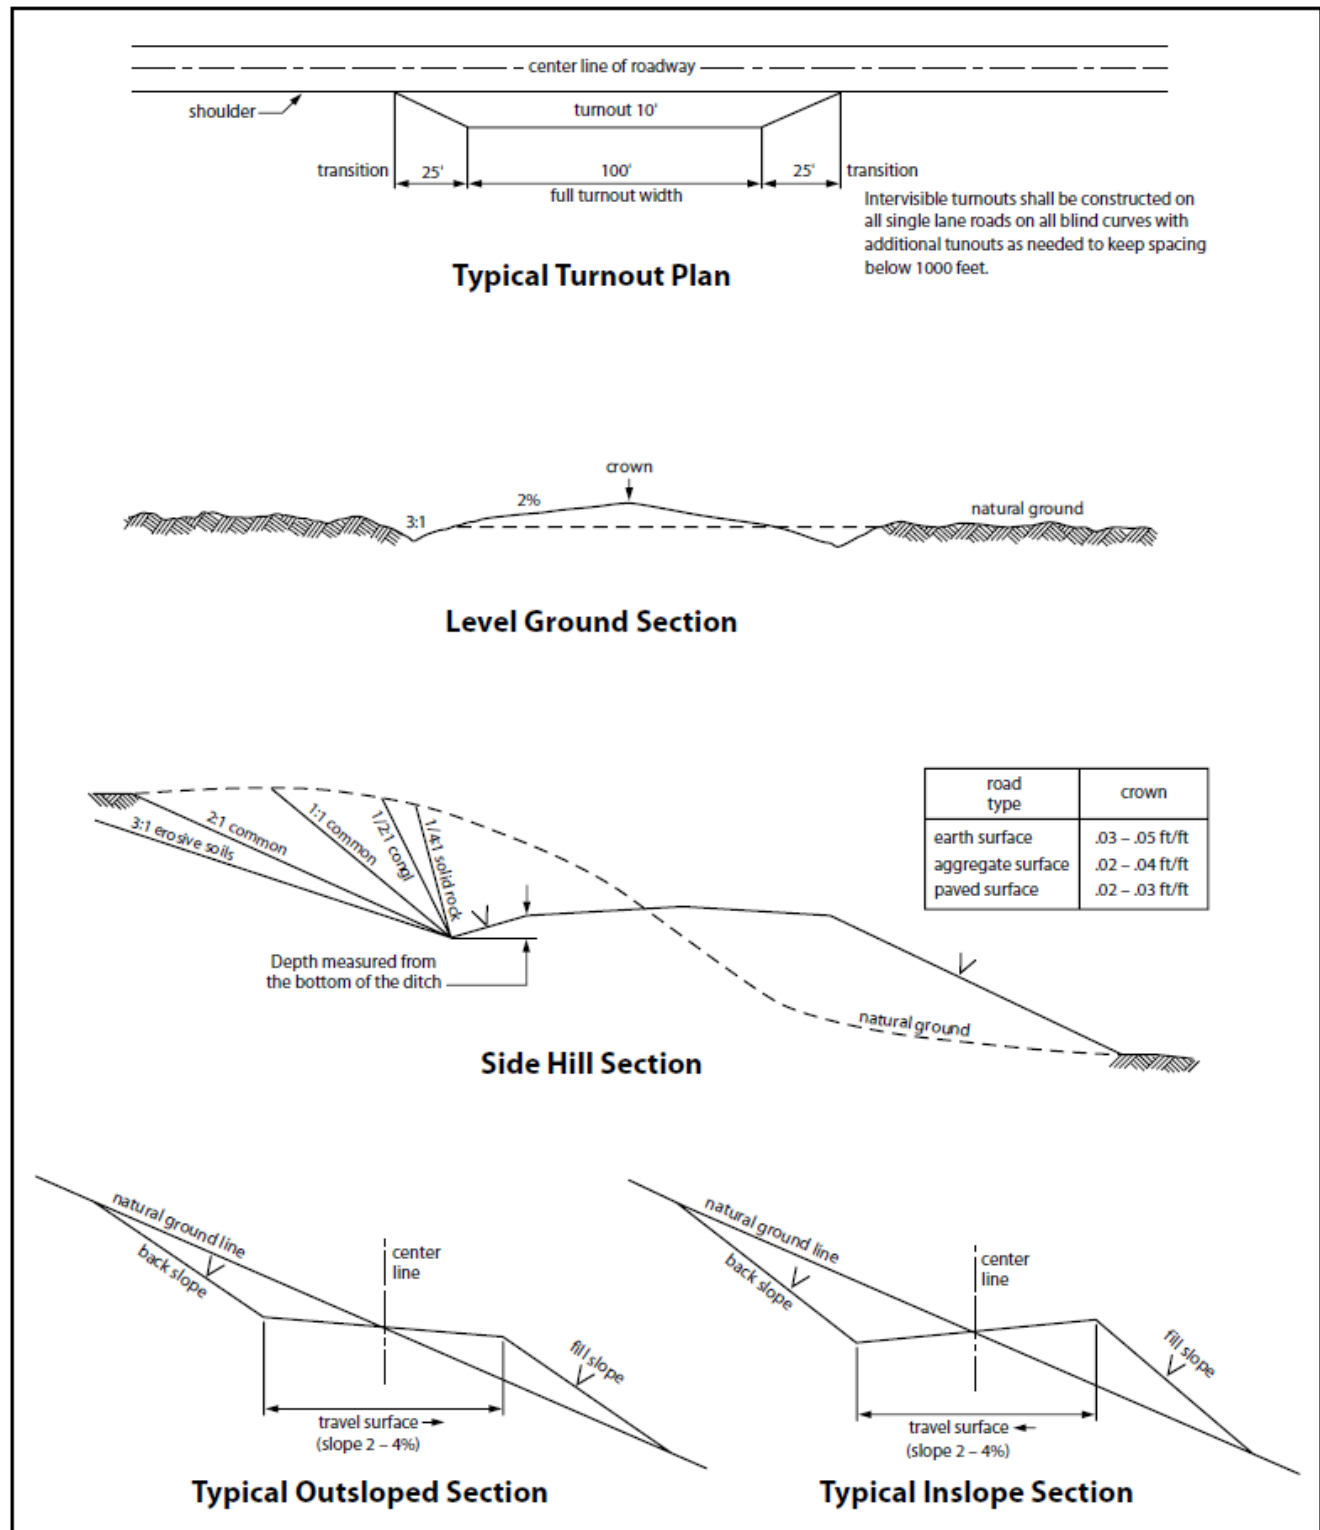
Cross-sections and plans for typical road sections representative of BLM resource or FS local and higher-class roads.
